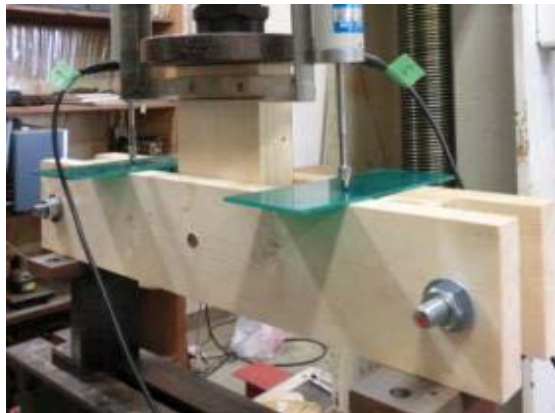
Setup of double shear test with the loading direction perpendicular to the grain of side member.
